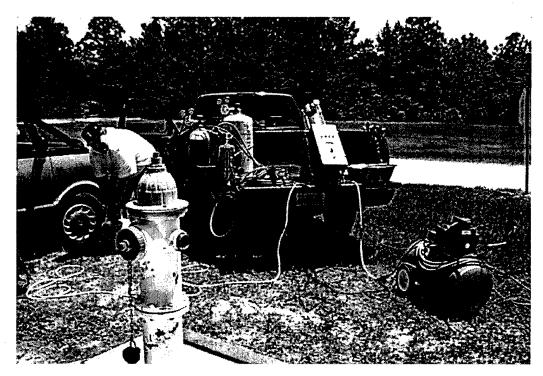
Preparations for TSV application on hydrant near Building 6029.
